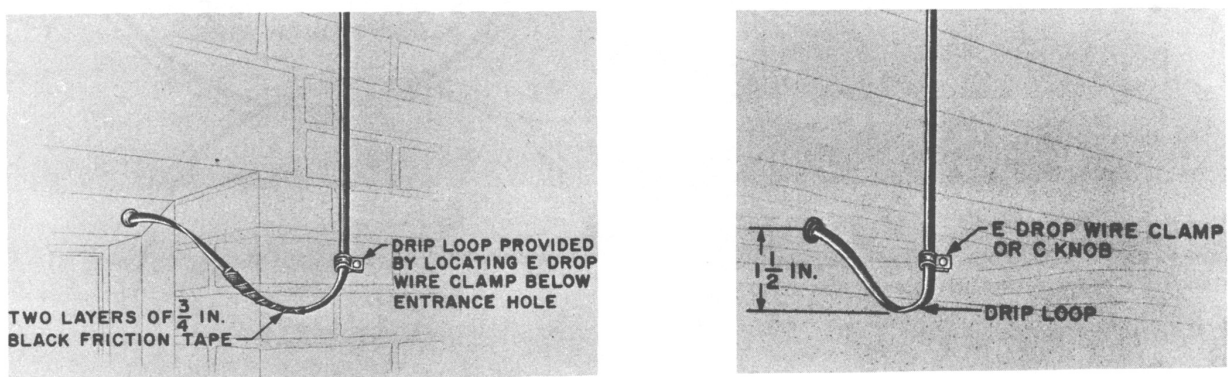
Last Attachment, Building Entrance Hole Does Not Slope Upward from Outside
